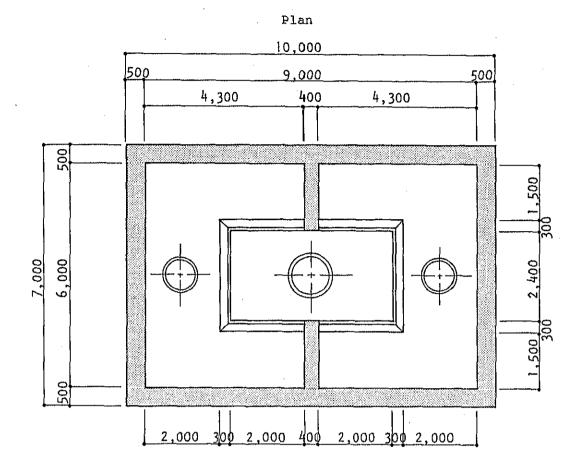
<u>PUMPING WELLS</u> (Northeast Plant)
